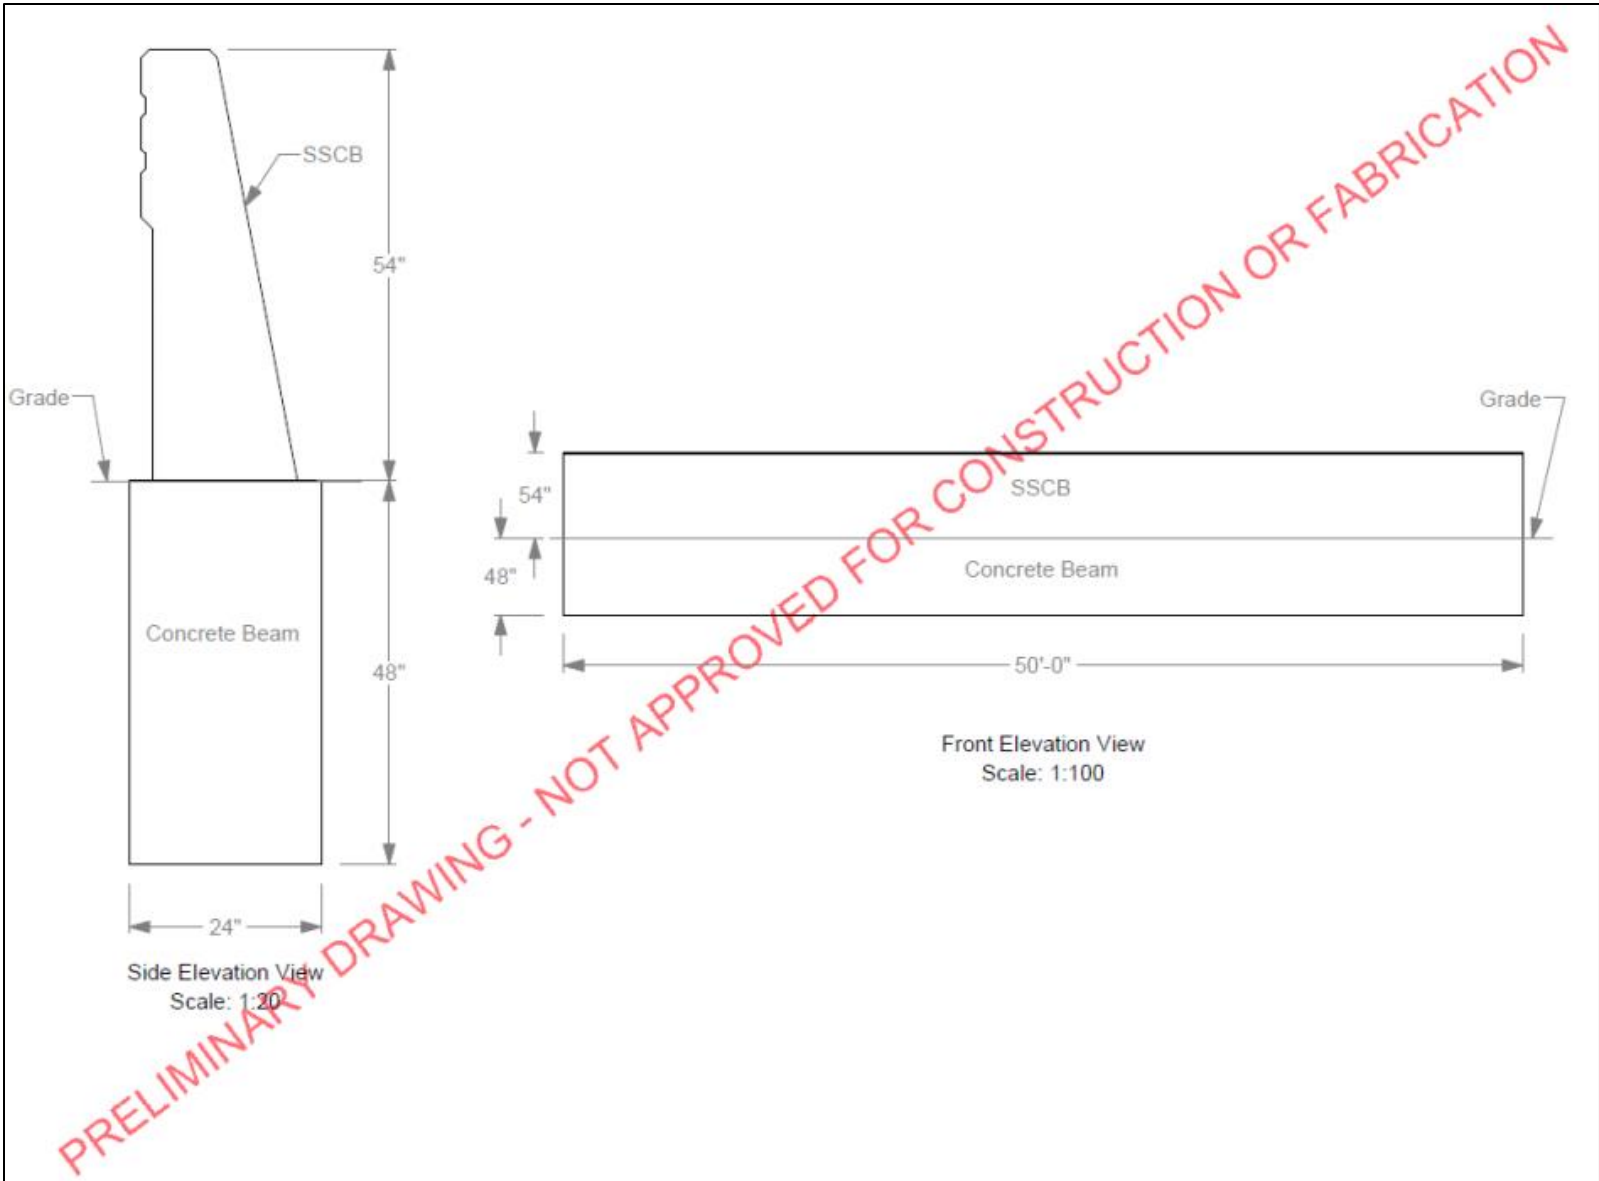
Design Concept 2 – Concrete Beam Design (TTI, 2017)
